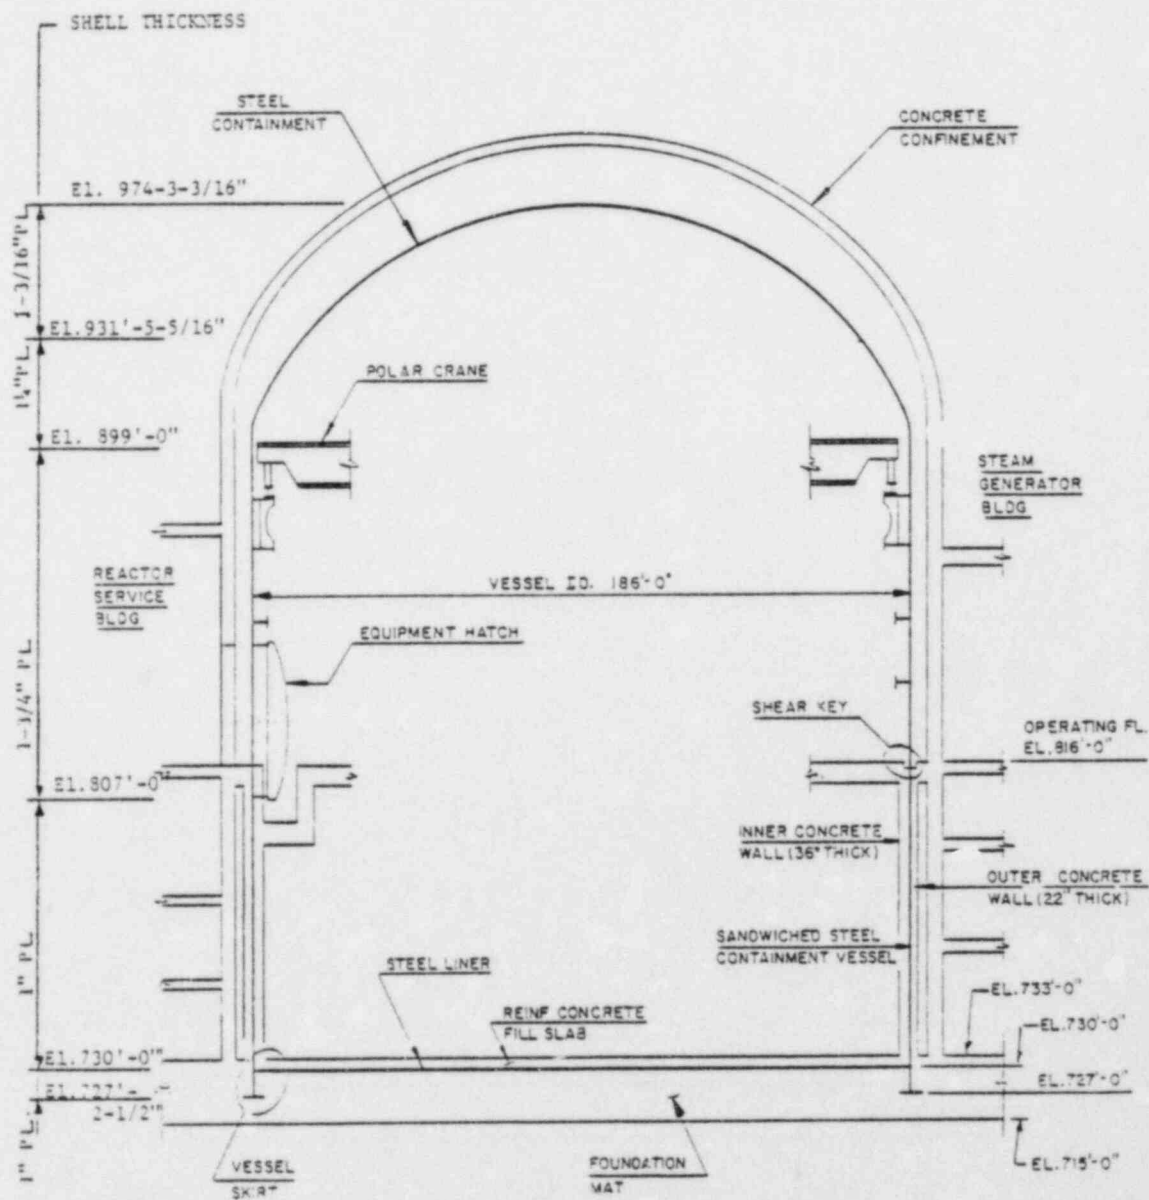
(d)-1 CONTAINMENT BUILDING CROSS SECTION
